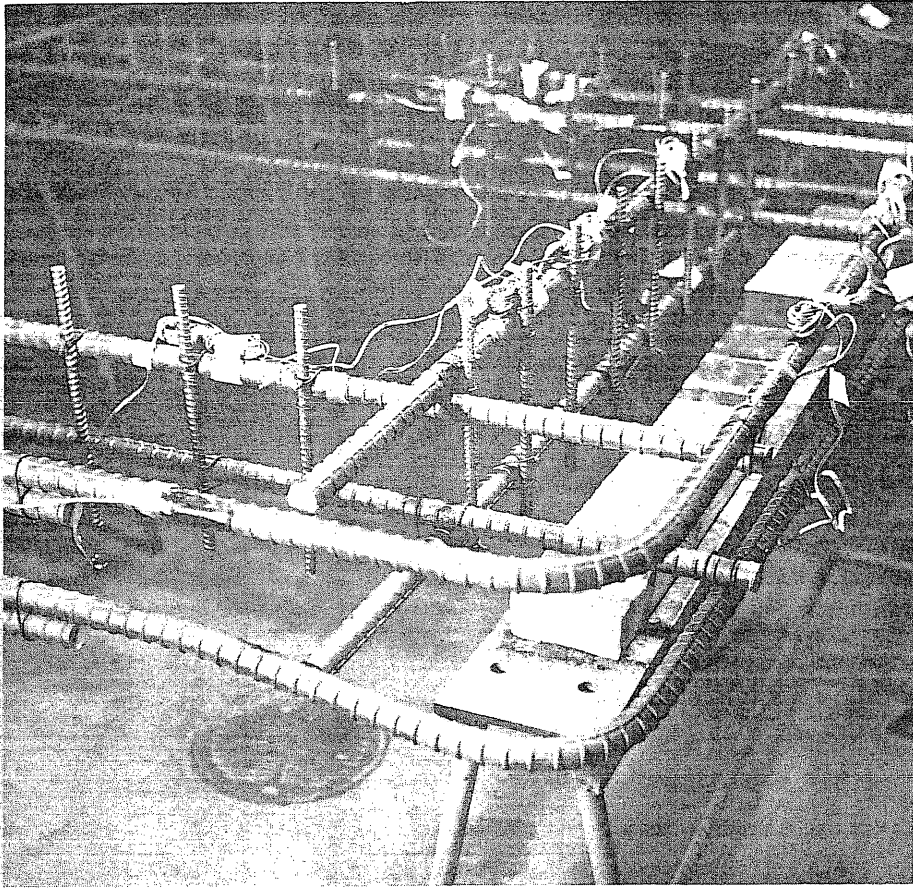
PHOTOGRAPH OF CORNER REINFORCEMENT DETAIL, SPECIMEN R1
